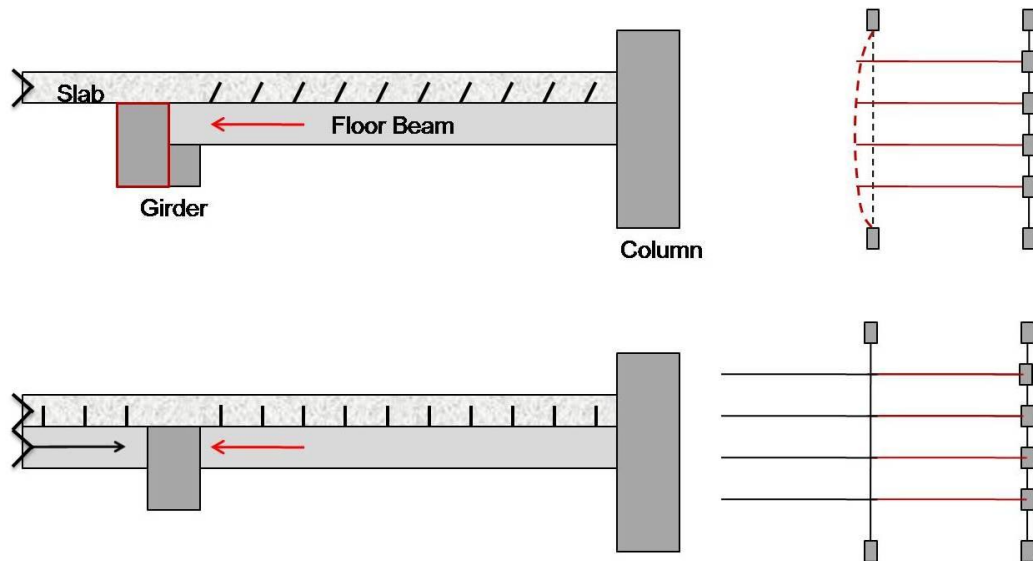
Schematic of effects of heating from fire on asymmetric floor framing (top) and symmetric floor framing (bottom).
